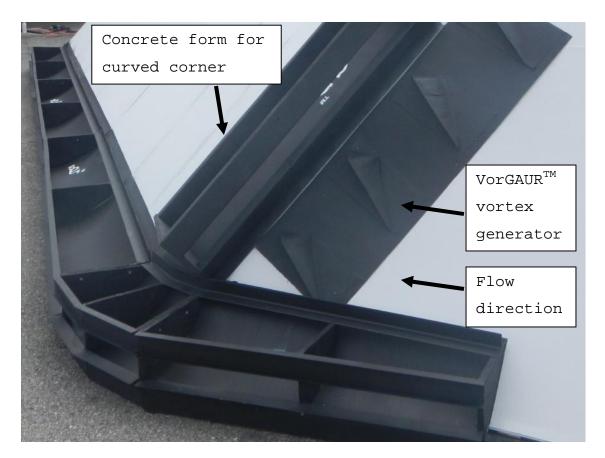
Photo of example $scaur^{TM}$ new construction concrete forms (black) for a 45° spill-through abutment. Note stainless steel $VorGAUR^{TM}$ vortex generators mounted after concrete construction.
